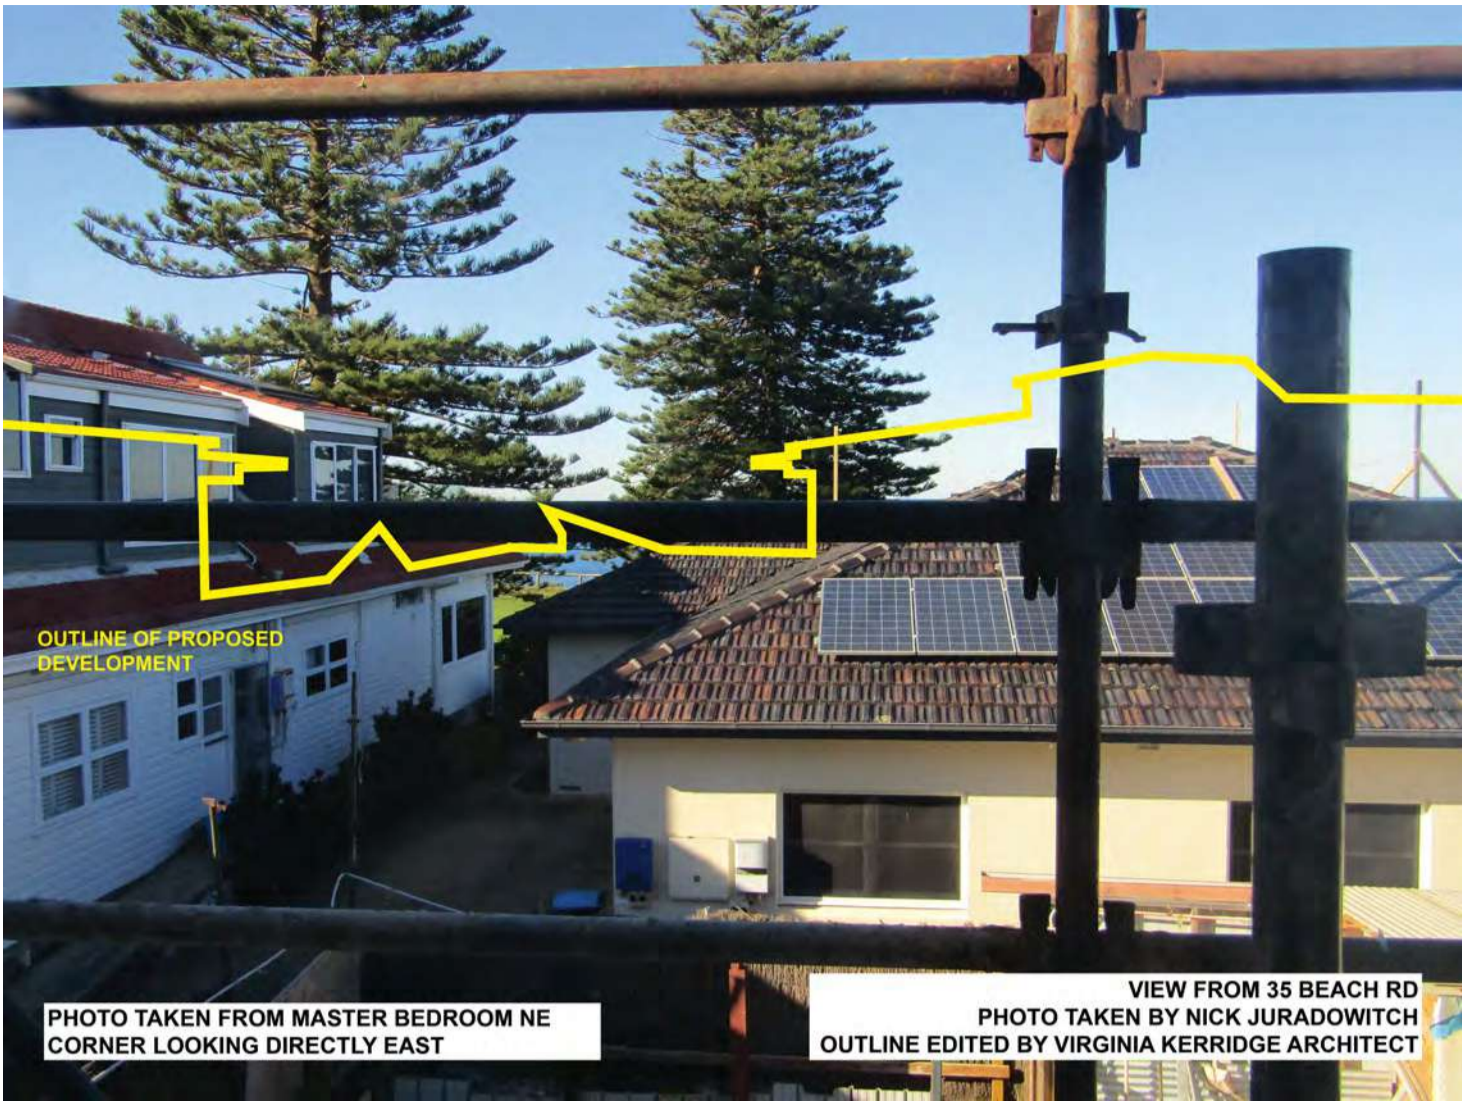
PHOTO EDITED BY VIRGINIA KERRIDGE ARCHITECT.
